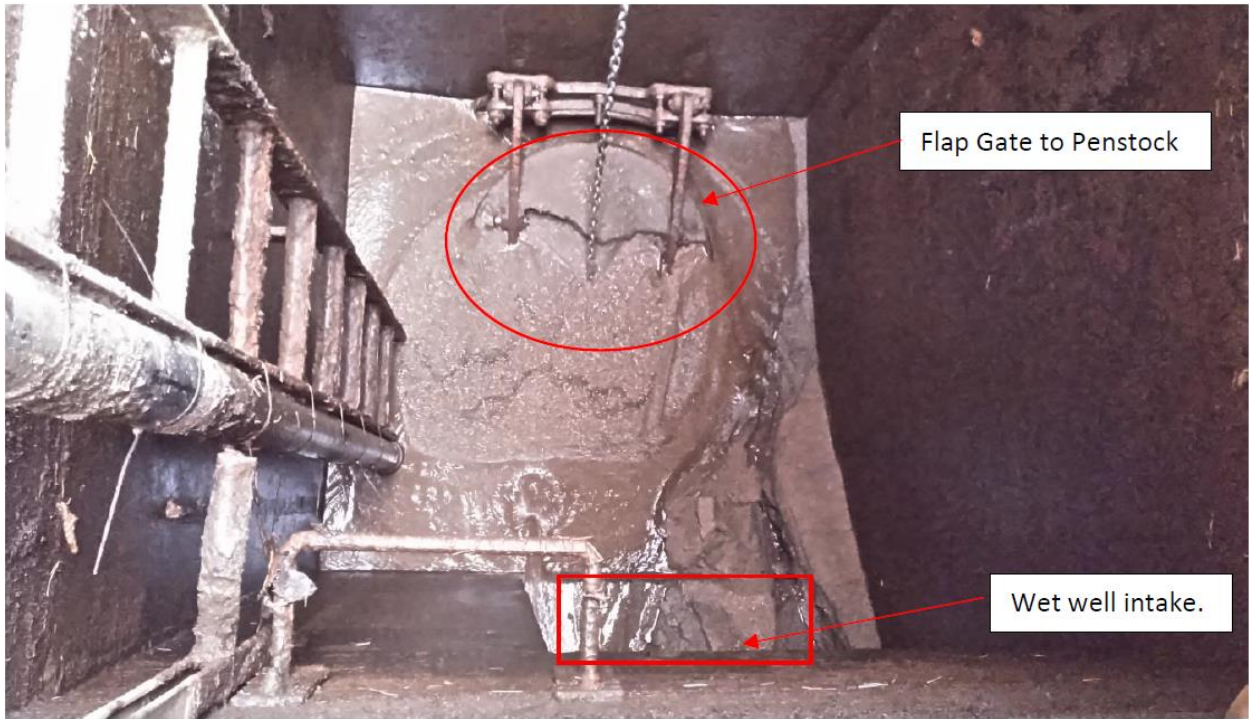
Sediment buildup in the wet well. (Photo taken from STS Hydropower, LLC memo summarizing field work provided to State Water Board staff on October 11, 2023)
